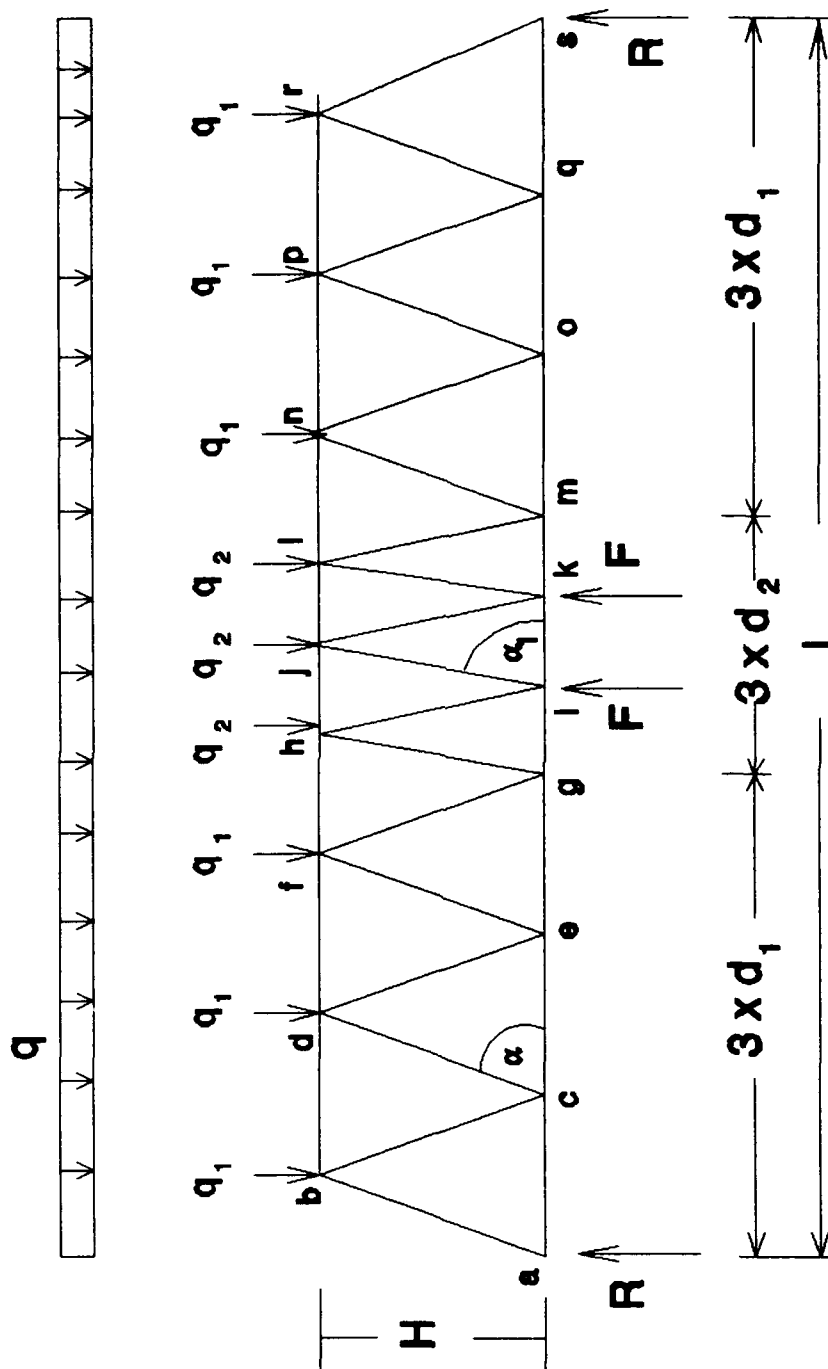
TRUSS MODEL SHOWING THE NODES AND ELEMENTS
